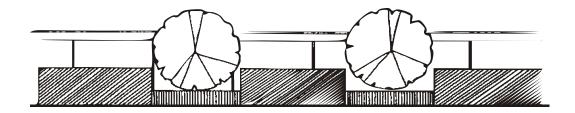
of 4 - Street Elevation drawing on street where there are existing trees whose crown conflicts with the proposed awning.
